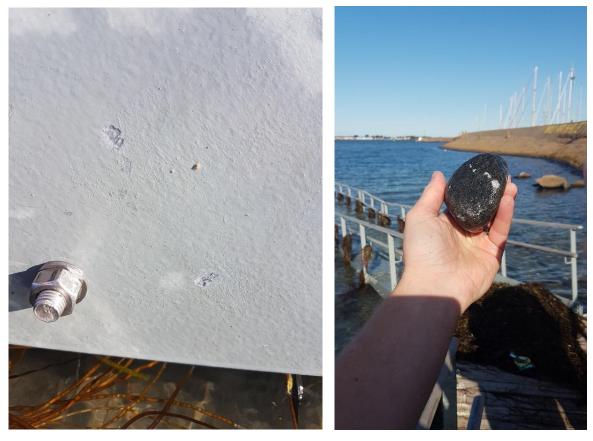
A damage in the coating was introduced by throwing a rock at the outside girder of the ramp. The impacts tended to create indentions in the coating rather than chipping it. Some zinc got stuck on the stone. The DFT in the indentations was about  $40\mu m$ .
